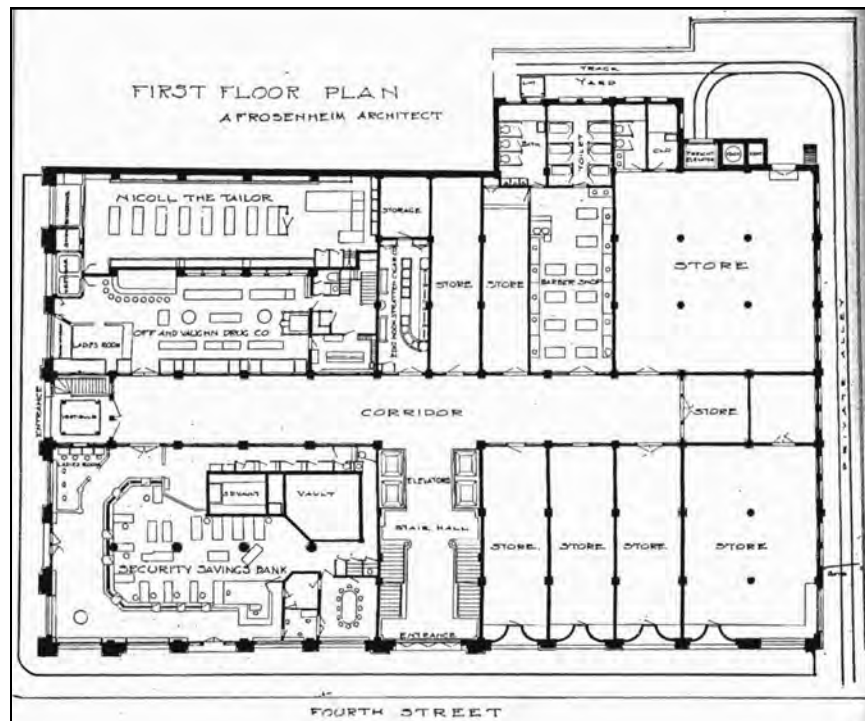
First floor plan. (*The Architect and Engineer of California*, 1906)
